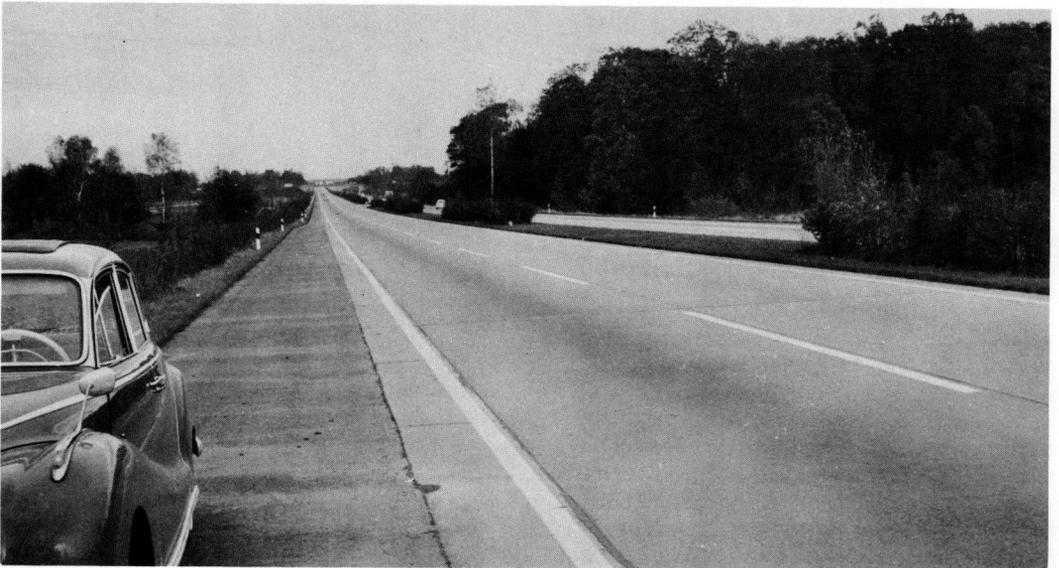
Concrete Autobahn near Baden-Baden, Germany, showing use of black concrete shoulder, white concrete strip for edge marking, and normal colored concrete roadway.
